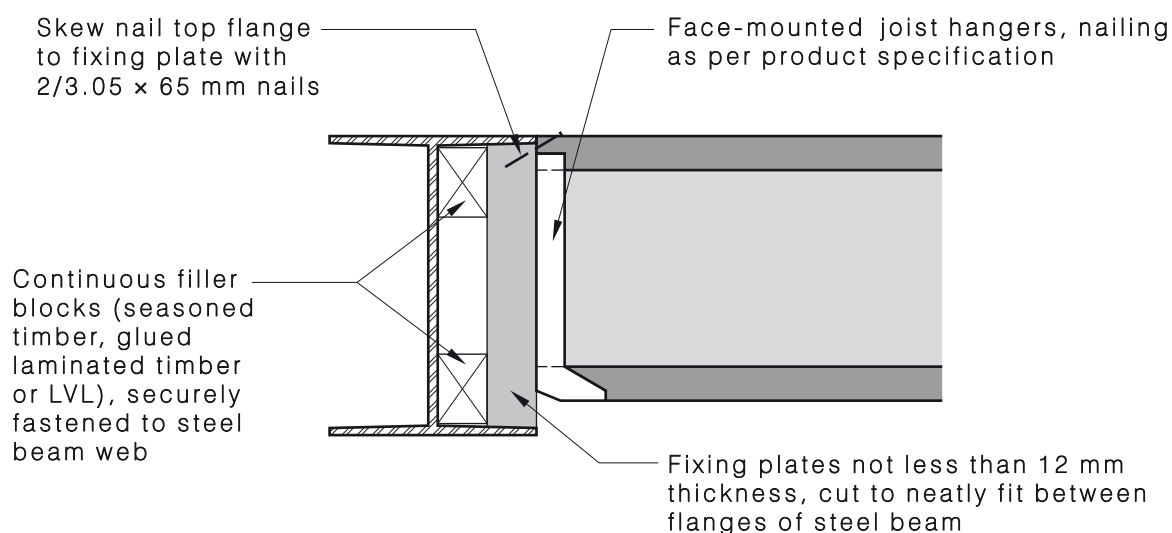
CONNECTION OF I-JOISTS TO A STEEL BEAM—METHOD 1
